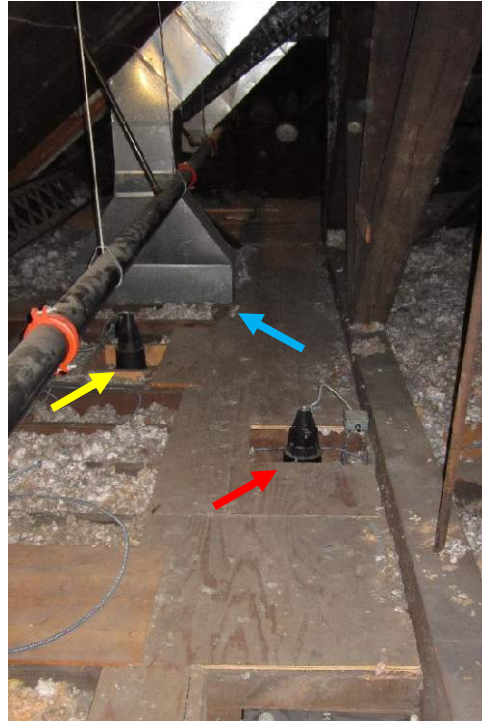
Area above plaster failure, in attic, looking west.
